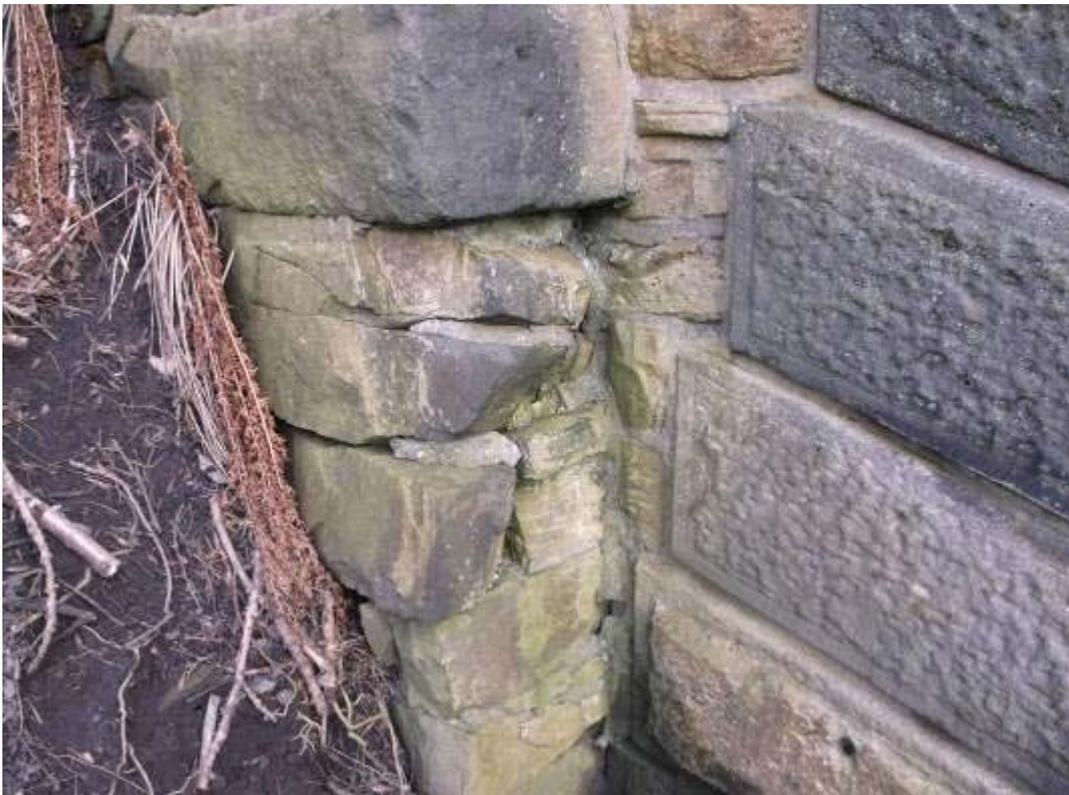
Vertical stepped fracture to north wing wall
